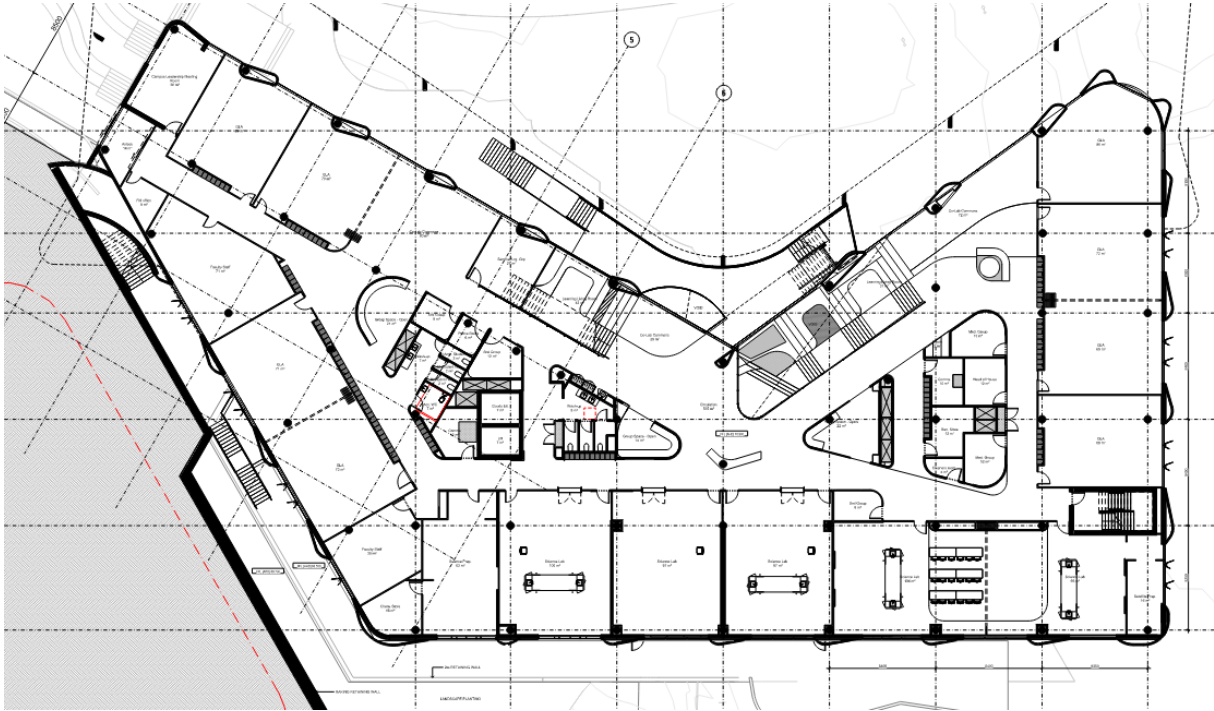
Proposed Lower Ground Floor Plan (DesignInc)
